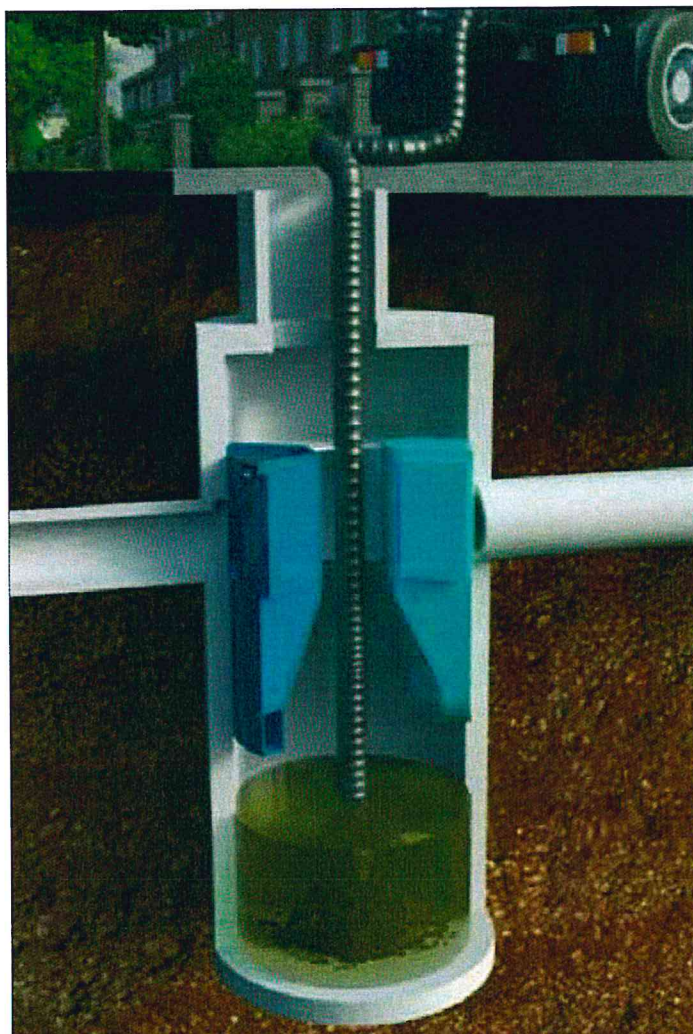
Sediment is removed with a vactor hose (First Defense model FD-4, shown).
